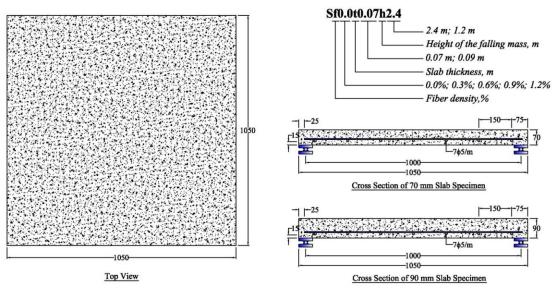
Tested slabs layout and details (all dimensions in mm)
